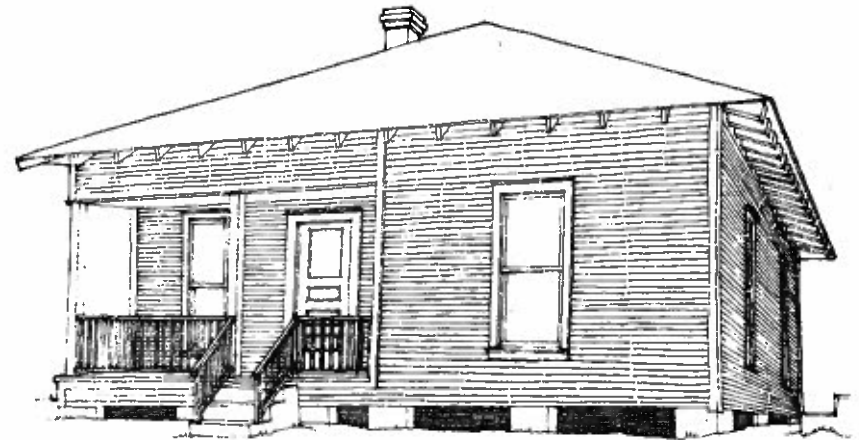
The Pyramidal. After rehabilitation, this house has a new roof in earth-tone composition shingles, restored rafter tails, painted wood siding, restored double-hung wood windows, repaired foundation, and rebuilt wood railing and balusters.
